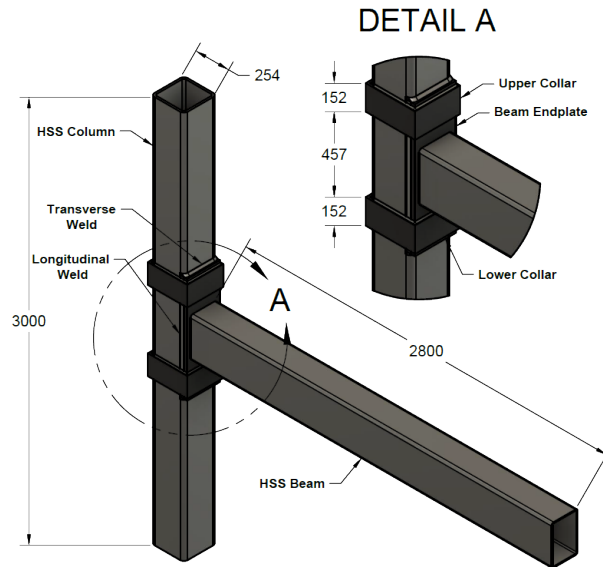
Schematic of the HSS-based collar connection. (Units: mm)
